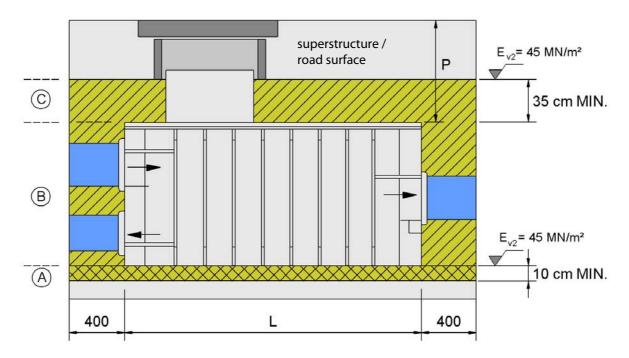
Construction layers for backfilling with coarse/non-binding and compressible ground materials
